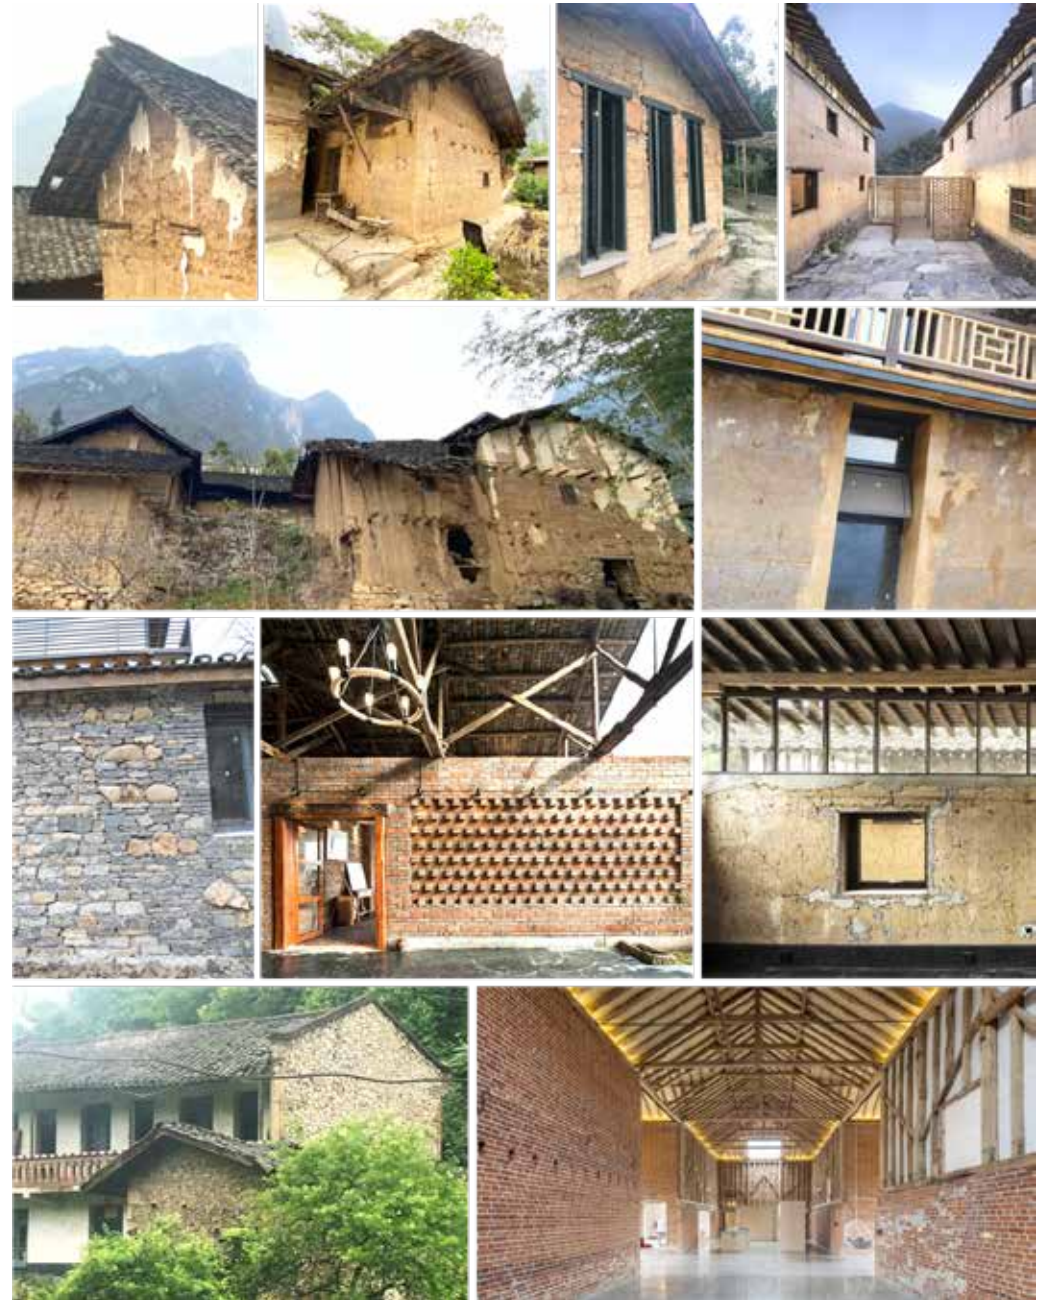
Rammed earth wall and brick masonry wall (source: photo by author)
